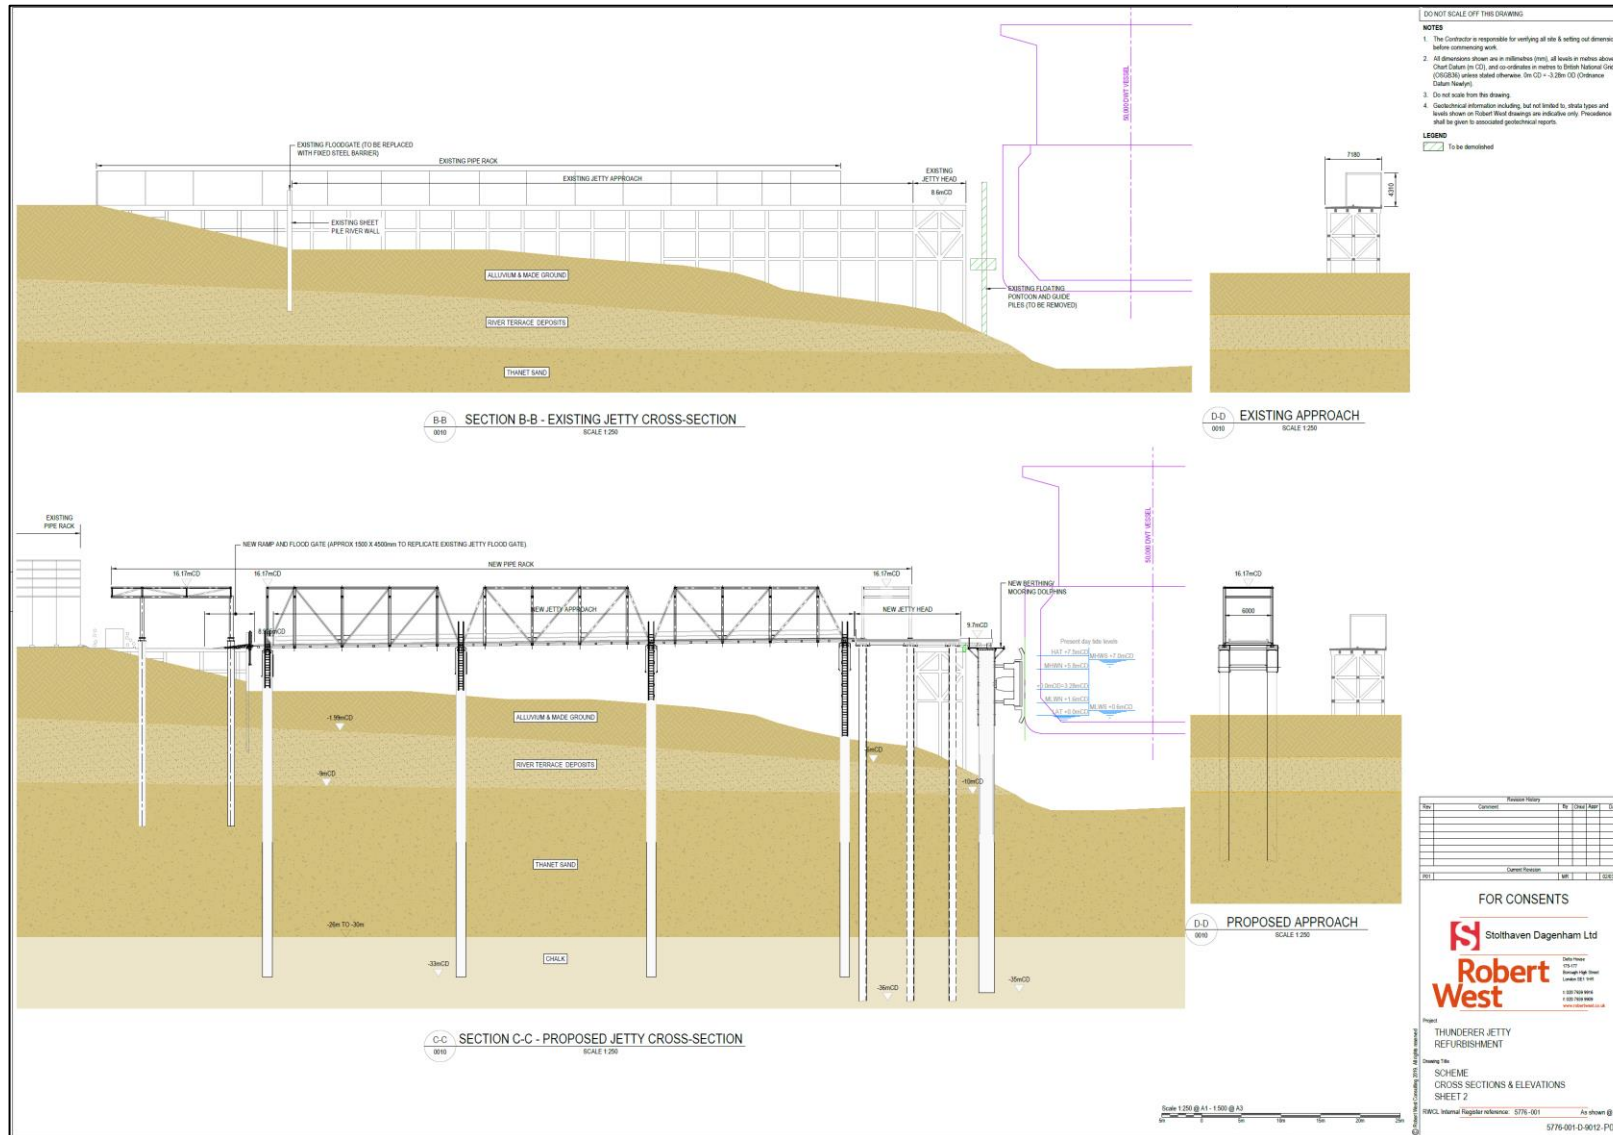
Proposed cross sections and elevations (Reproduced by courtesy of Robert West)
